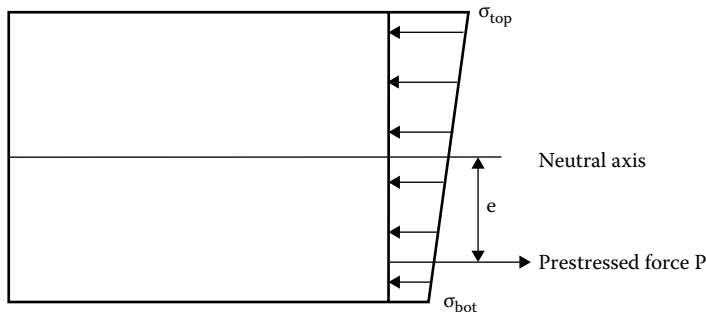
Beam stresses at service limit state for prestressed concrete section.
